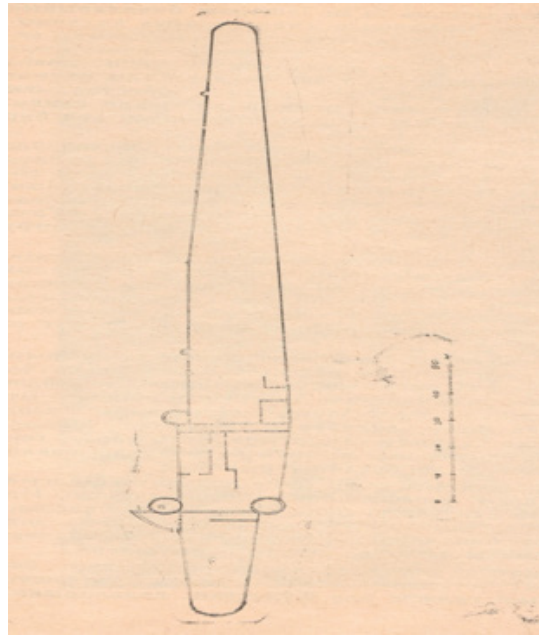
Plan of Gulistan castle (A.M.Mammadov)
